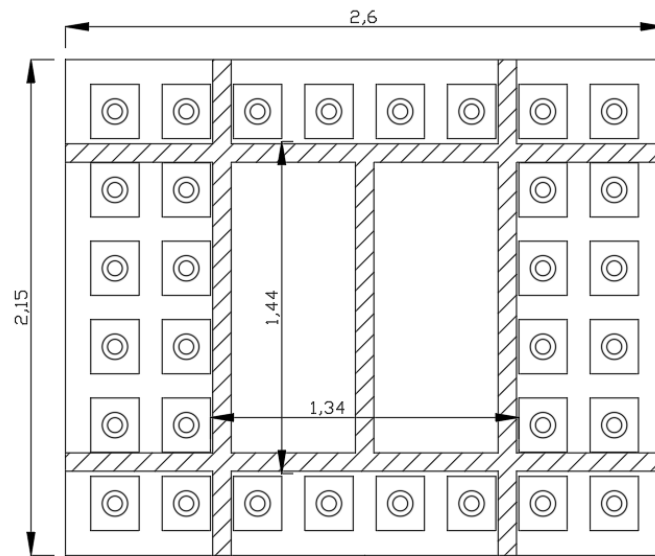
WindCrete fairlead anchor plate basic scheme with 32 posttensioned bars
